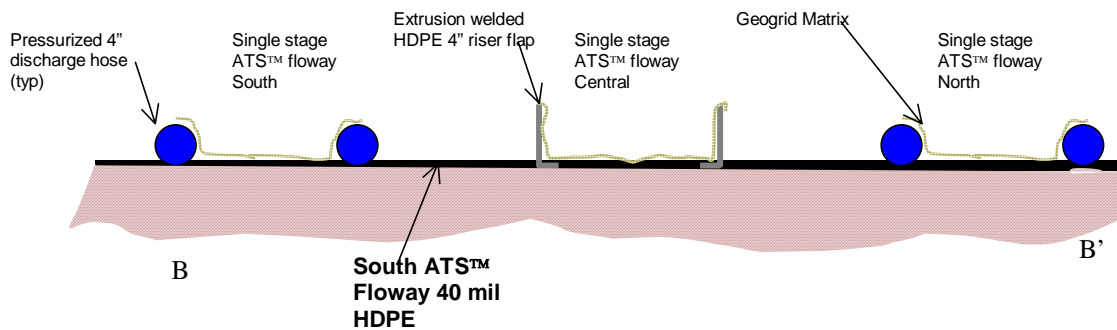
Section B-B' single stage ATS™ floways: drawing not to scale
